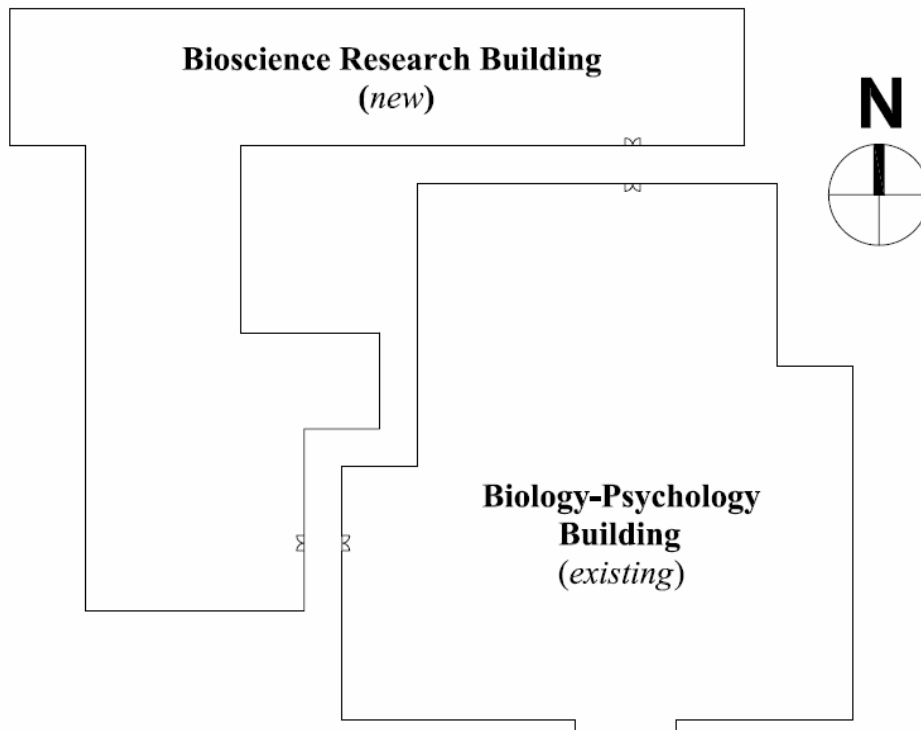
Proposed system design – buildings spaced 12-14 feet apart, with doorways shown
